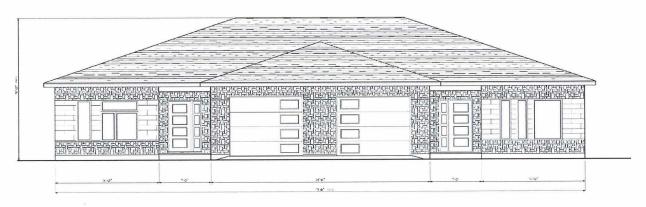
Proposed 1-Storey Semi Detached Dwelling
